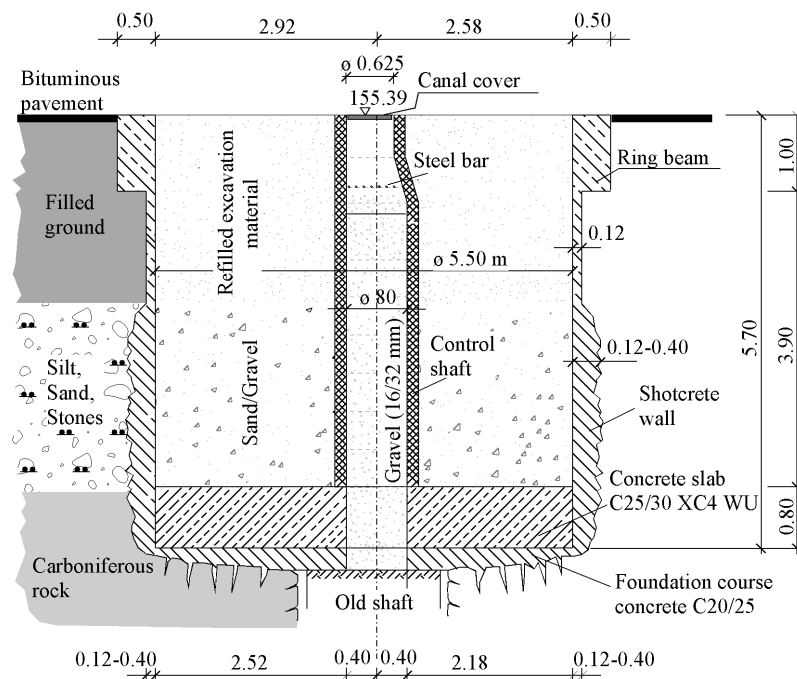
Profile of the excavation pit with old shaft and reinforced concrete slab
